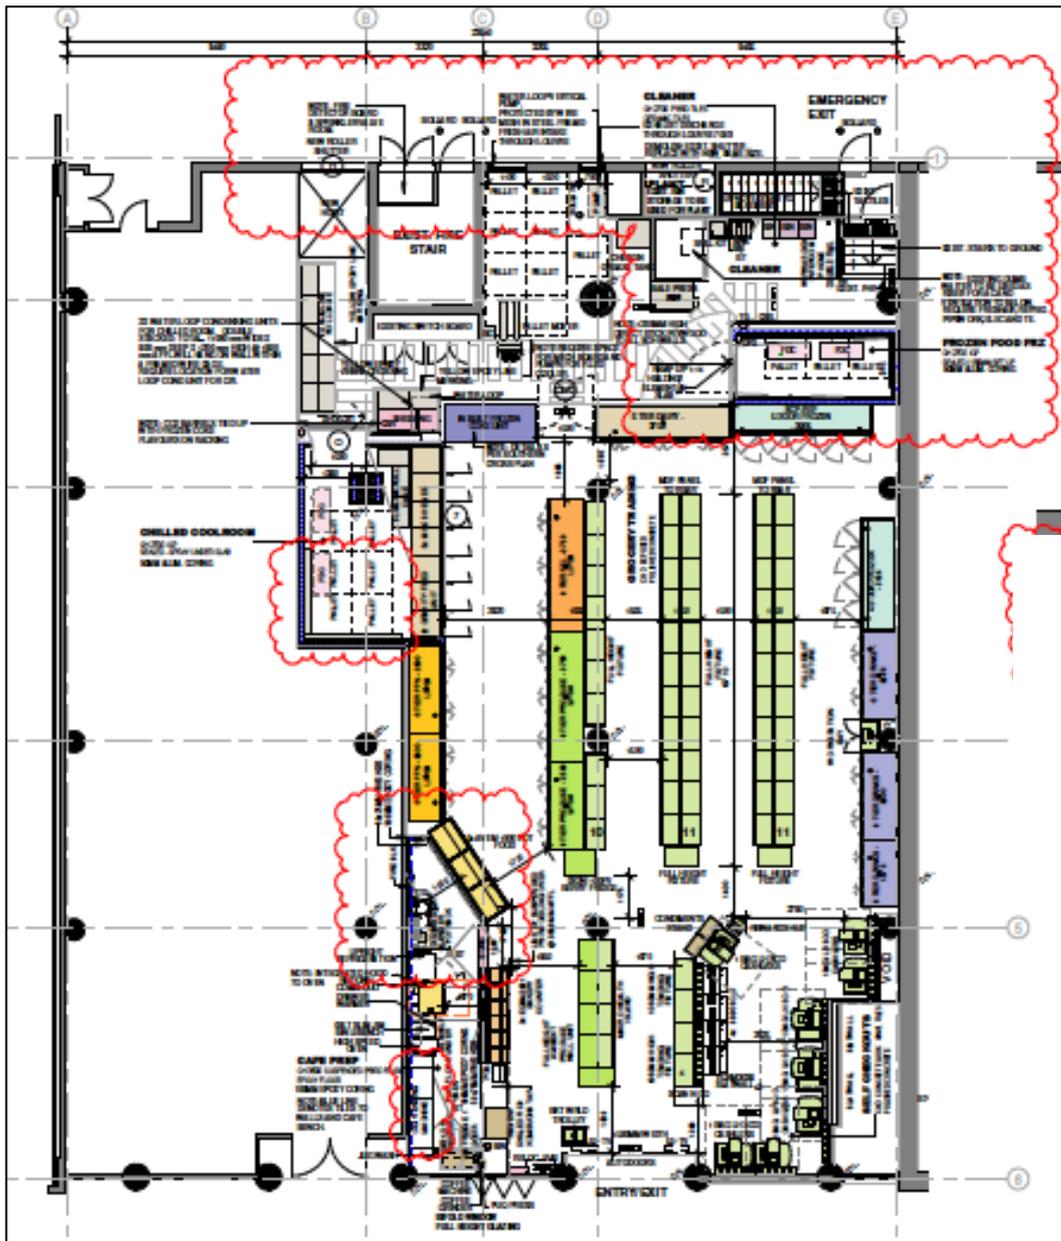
Proposed internal fit-out – Ground Floor Plan (WA200).
